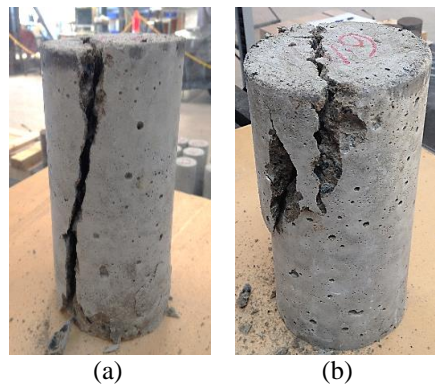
Short shear failures of specimens with 1% (a) and 6% (b) oil contamination
